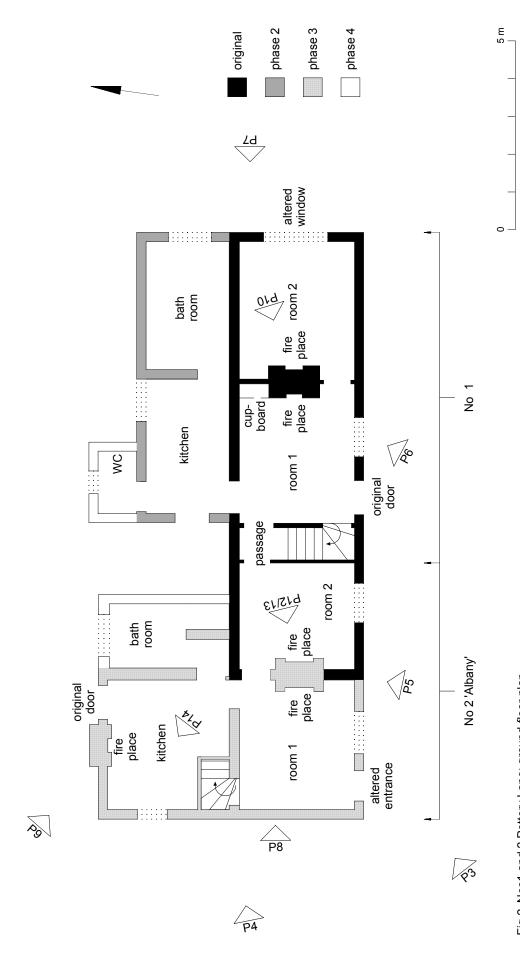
Nos1 and 2 Pottery Lane: ground-floor plan.
